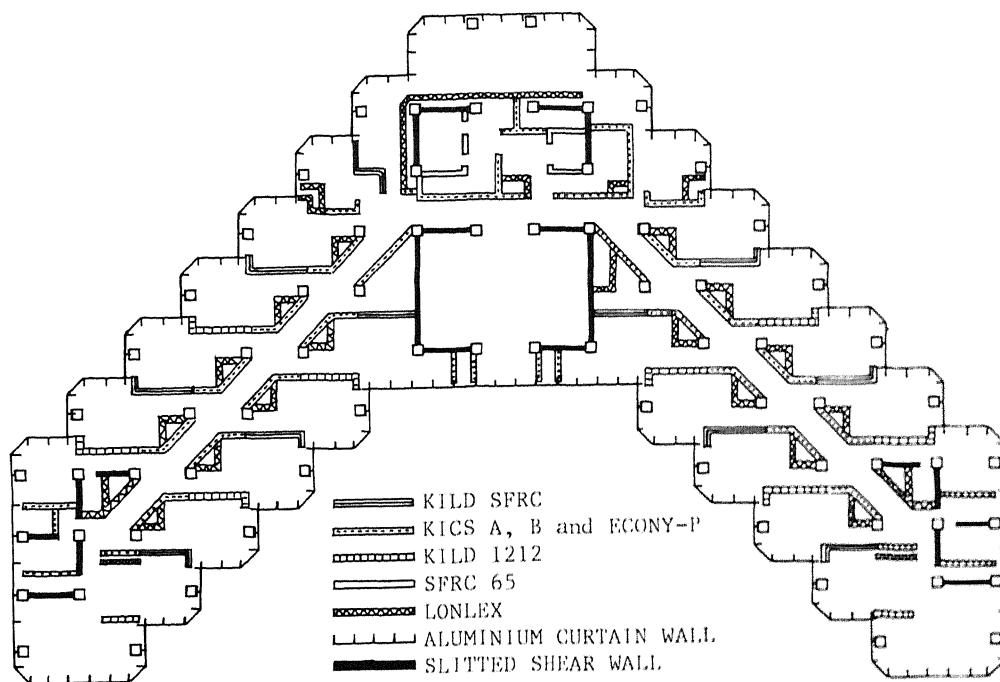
ARRANGEMENT OF NON-STRUCTURAL WALLS IN TYPICAL FLOOR
